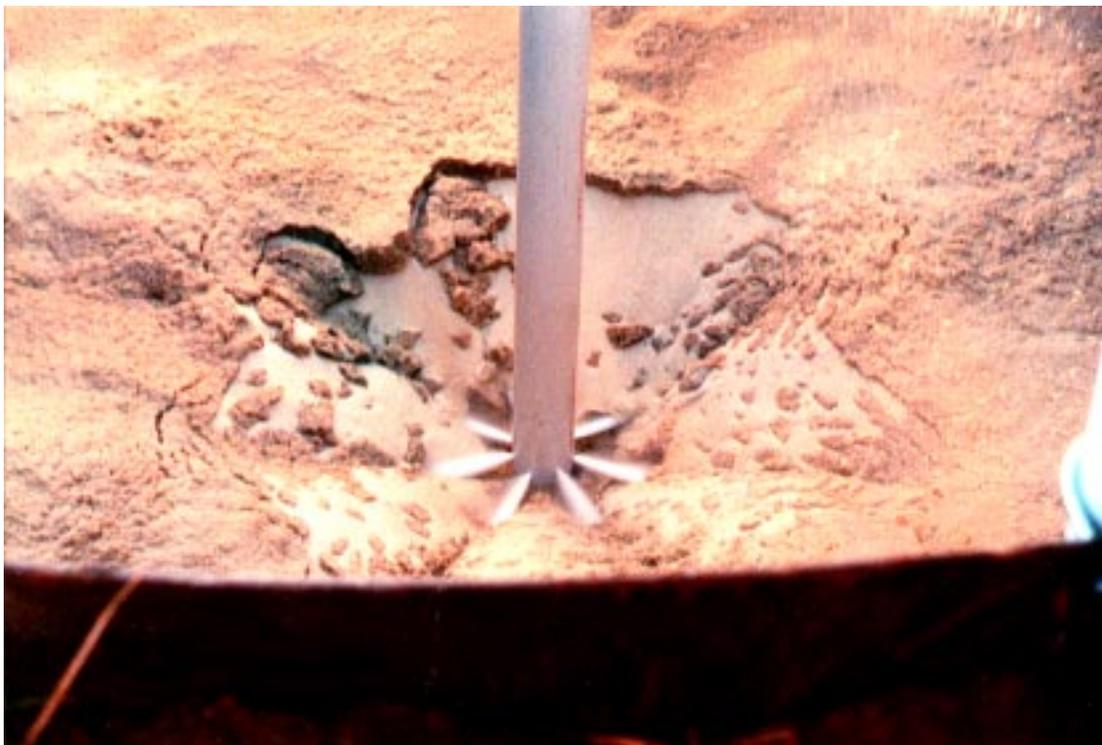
High-pressure jets from single-injection tool cutting through PVC casing.
